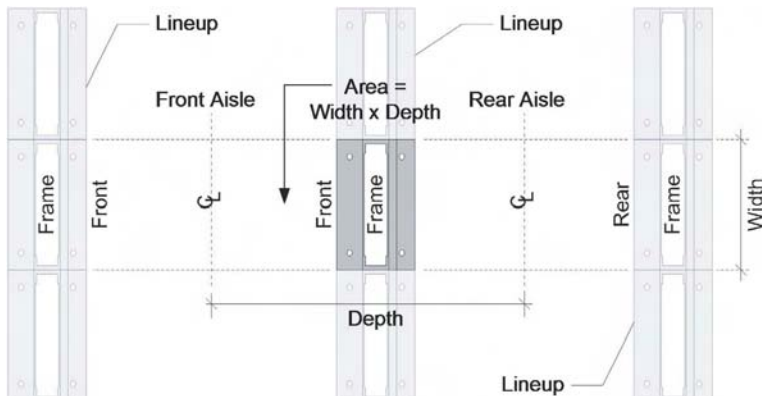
Equipment frame area for NEBS heat dissipation (frame in center of drawing). This illustration shows the plan view of equipment frames and aisle spacing.
